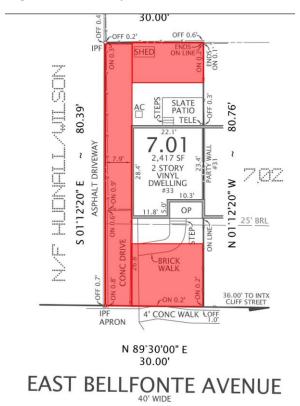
33 East Bellefonte Avenue - Non-buildable Area
